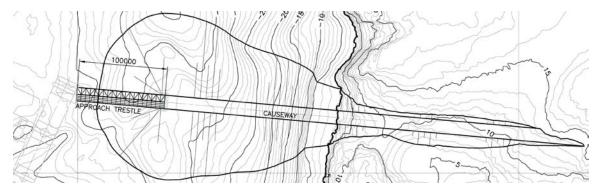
Plan, Approach 3 for Steensby Island Ore Trestle (see Appendix A)
